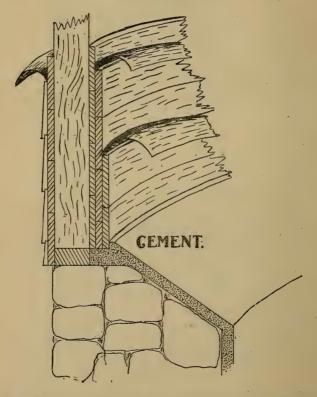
Showing construction of all-wood silo, and connection with wall, flush with outside.
